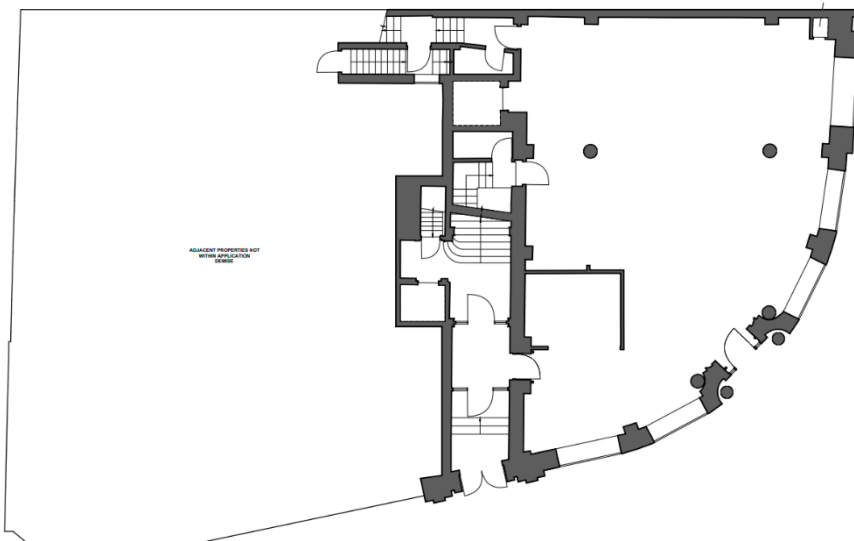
Existing ground floor layout showing upper floor entrance from Fowler Street and banking Hall
